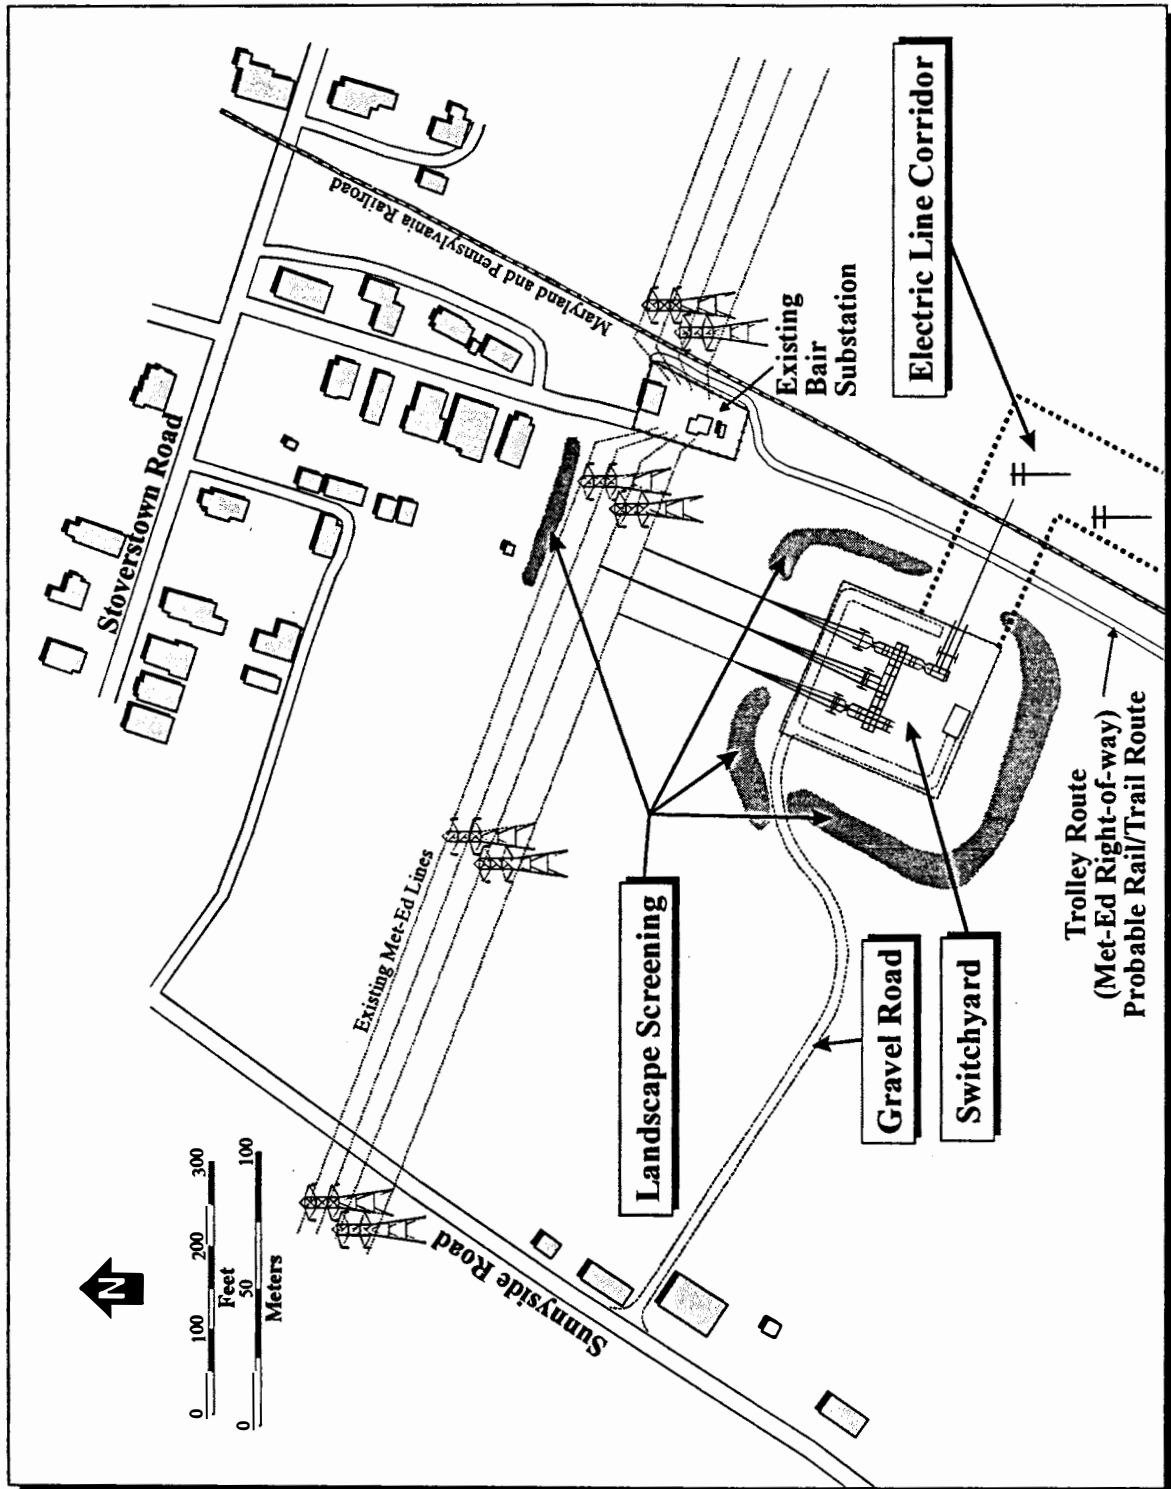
Location of potential rail/trail alignment (Met-Ed trolley route) and proposed switchyard visual screening.
